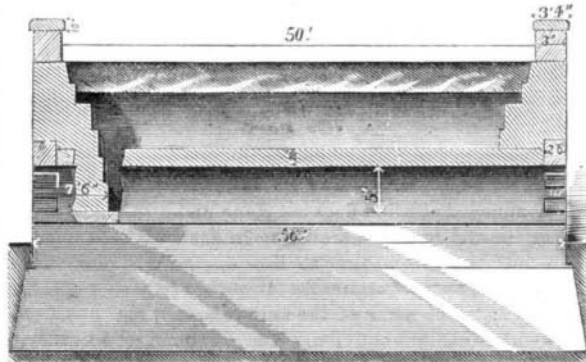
THE UNDERGROUND RAILWAY, NEW YORK CITY.—END ELEVATION OF THE VIADUCT.
